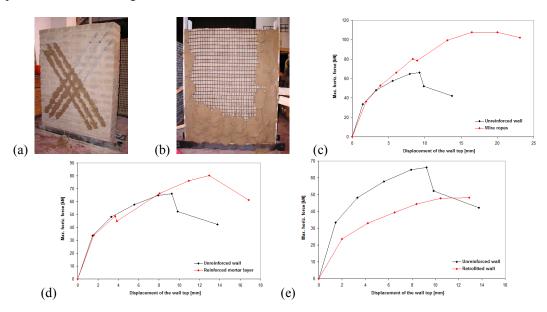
(a) Reinforced adobe wall with steel ropes. (b) Reinforced adobe wall with geonets. (c) Behaviour of the wall strengthened with steel wire ropes compared to the unreinforced wall (d) Behaviour of the wall strengthened with geonets. (e) Behaviour of the retrofitted adobe wall by geonets to the unreinforced wall
